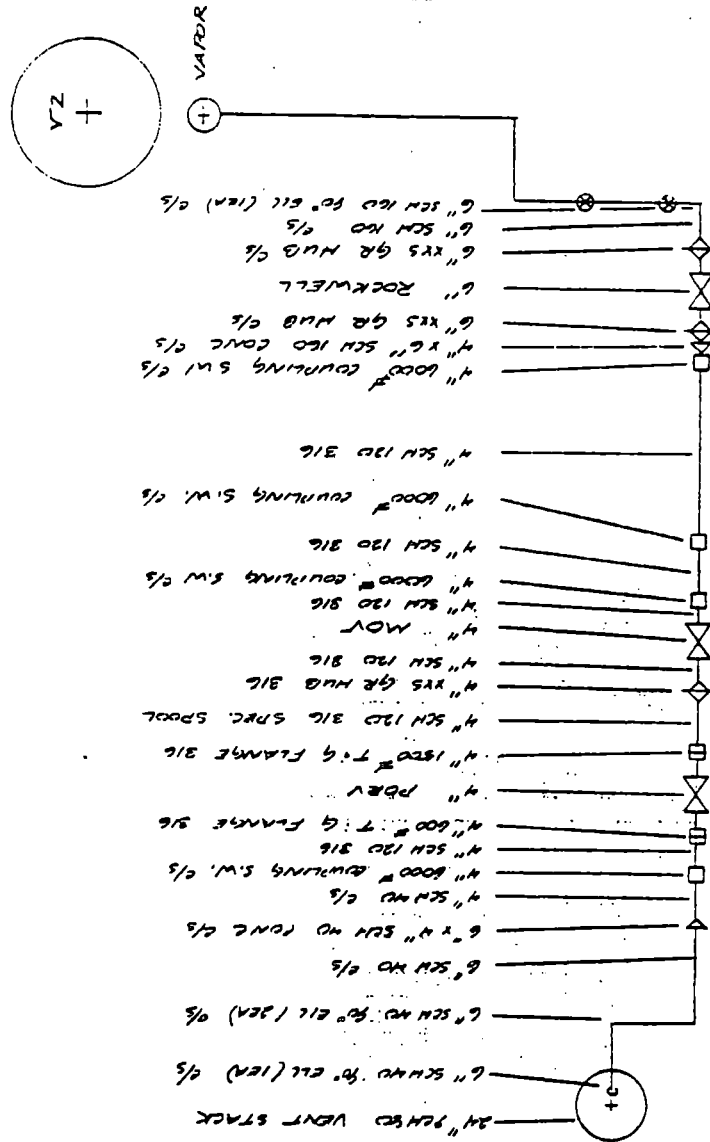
TEST VALVE INSTALLATION DIMENSIONS
